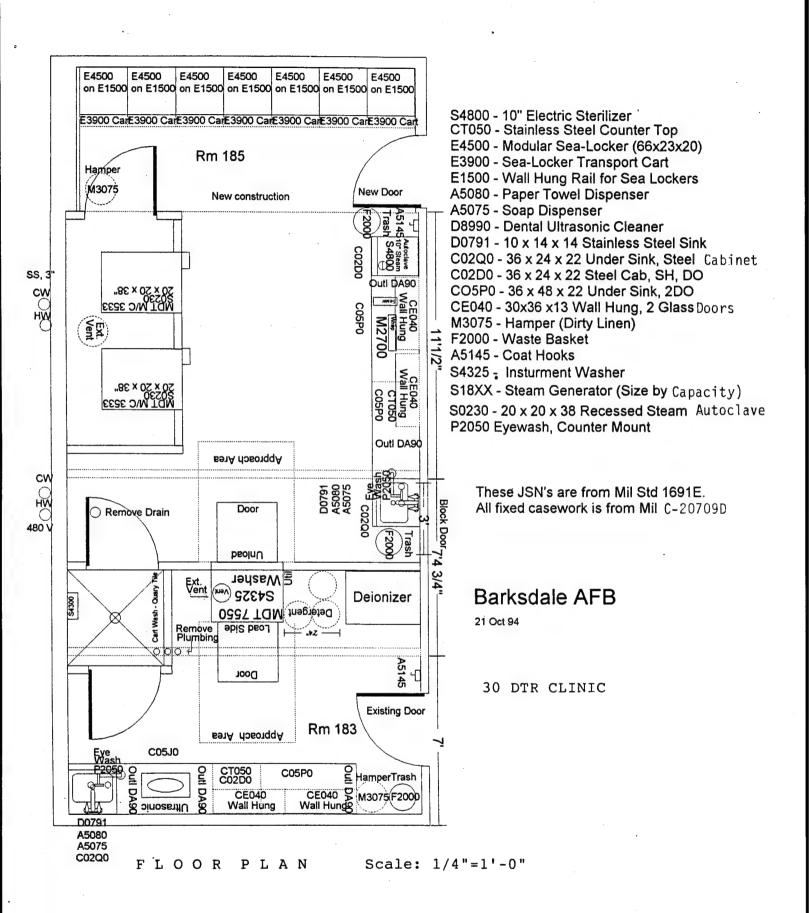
Medium Dental Instrument Processing Center Floor Plan
